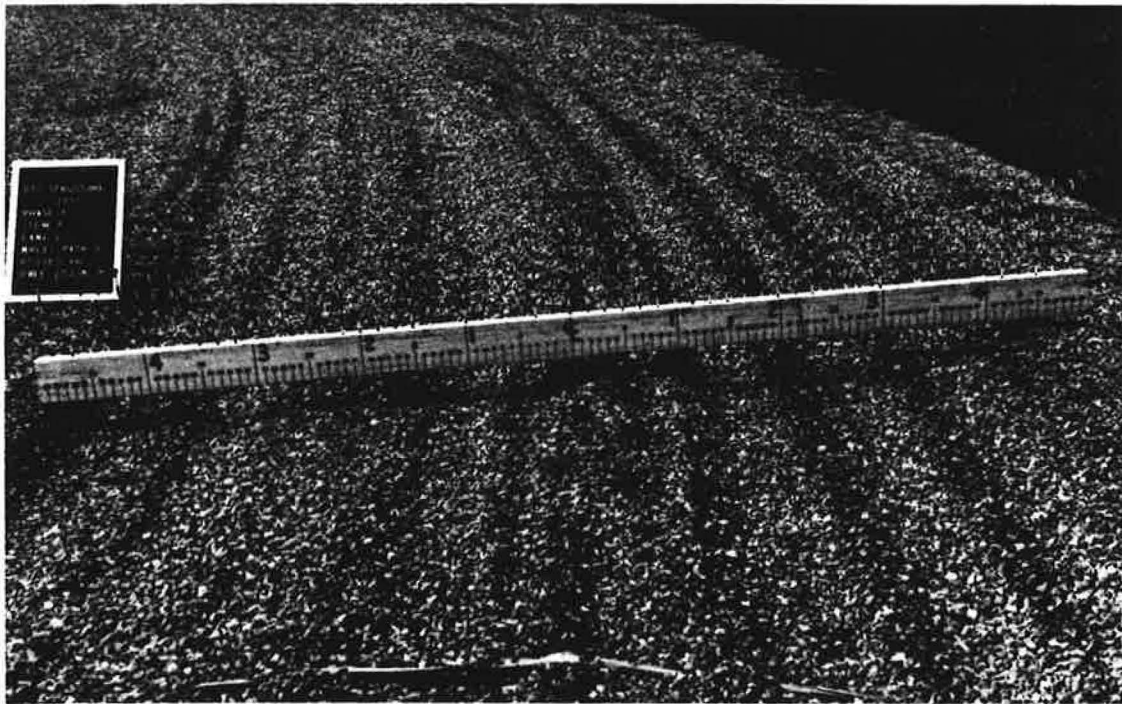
Low-pressure lane, Section 1, failure after 66 passes.
